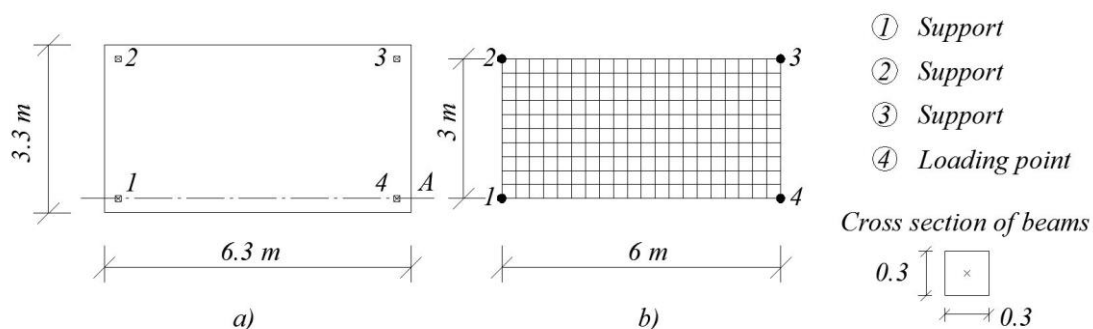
Geometry of the a) shell element model and b) beam grillage model of the rectangular slab with quadratic beam cross-sections.
